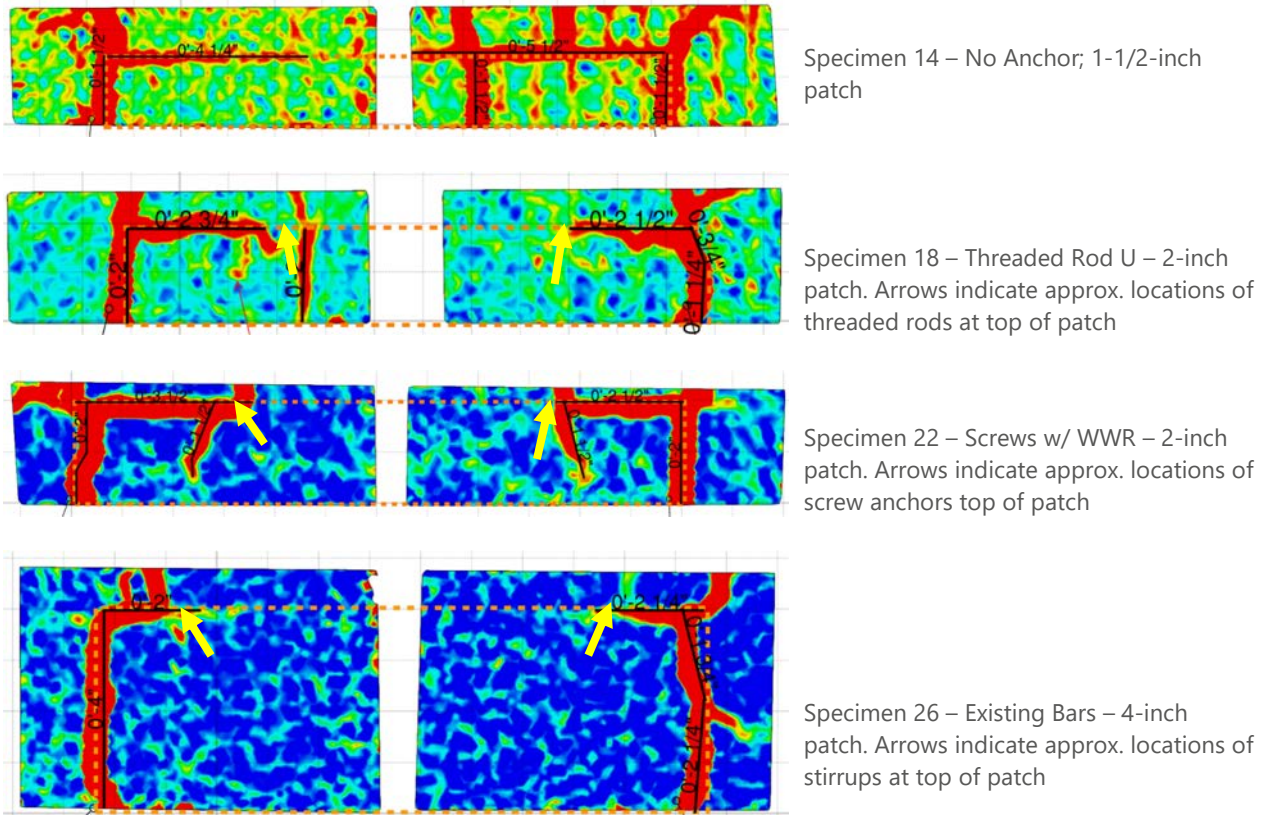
Examples of DIC images at 12.9 kips during final loading for specimens with different anchorage types. Black lines indicate cracks in and around patch. Note the restraining of horizontal crack propagation in specimens with anchors or stirrups crossing the interface.
